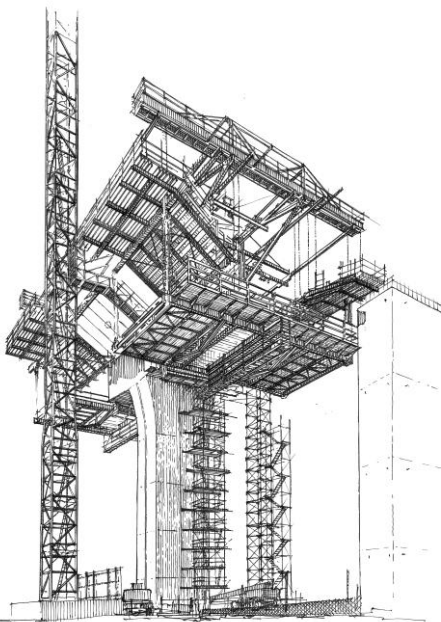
16th July 2018. Progress sketch showing travelling formwork for the construction of the cantilever wings and sloping section of the deck on the western approach spans.
